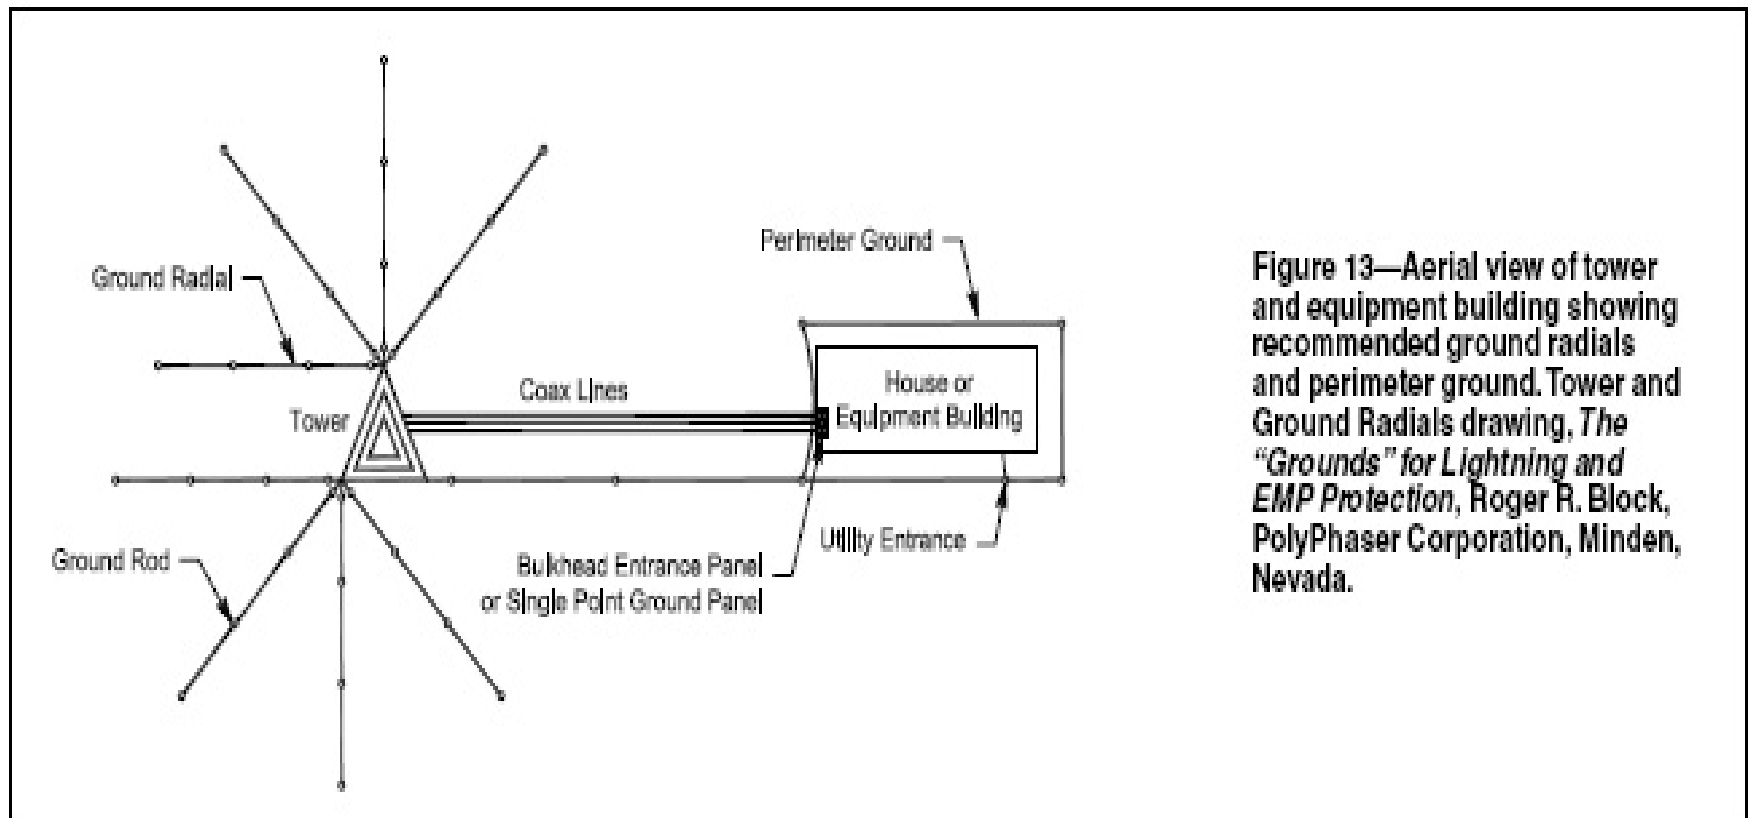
Aerial view of tower and equipment building showing recommended ground radials and perimeter ground. Tower and Ground Radials drawing, *The "Grounds" for Lightning and EMP Protection*, Roger R. Block, PolyPhaser Corporation, Minden, Nevada.
